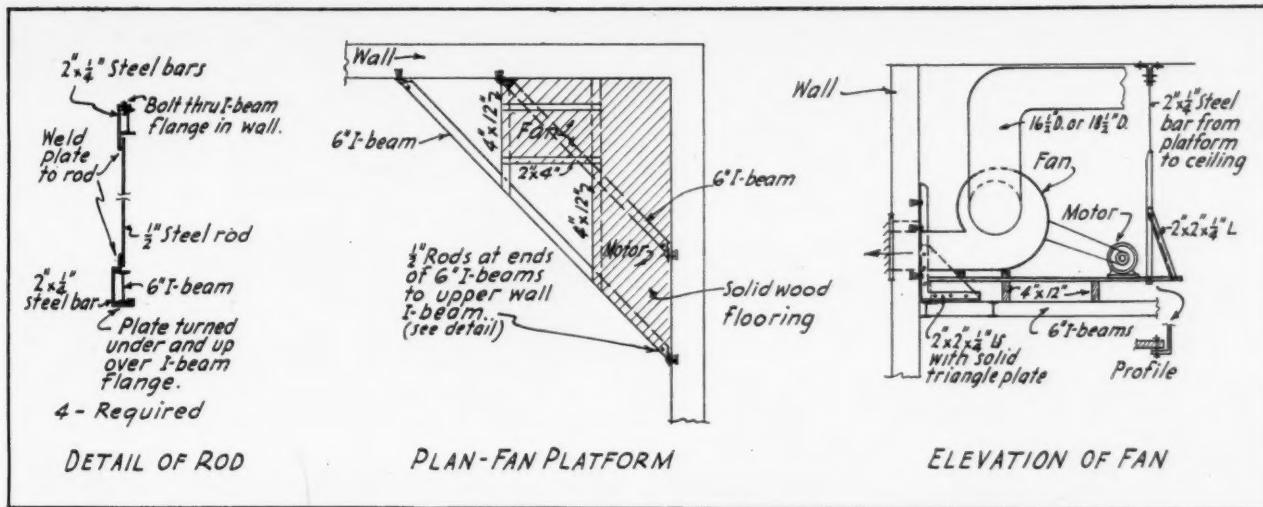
Details of fan support. Planking, on 2 by 4's, on 4 by 12's, on steel I-beams—all supported from above and secured to the walls—make a rigid support.
